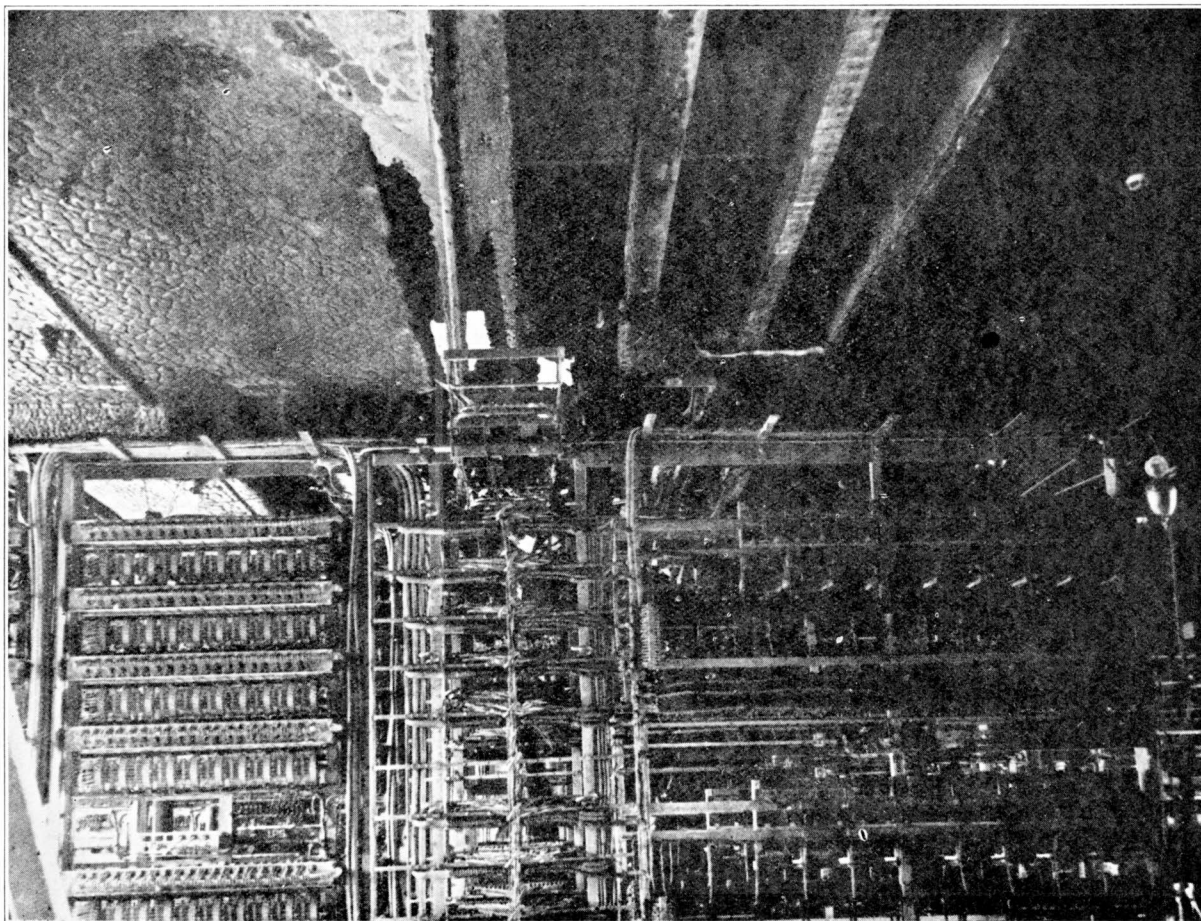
DAMAGED CEILING. DAYLIGHT SHOWING THROUGH DESTROYED ROOF.
